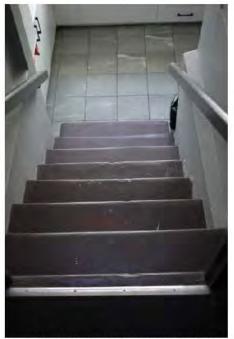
| Concrete stairs to mezzanine to be removed and hallway to be added over the void.
